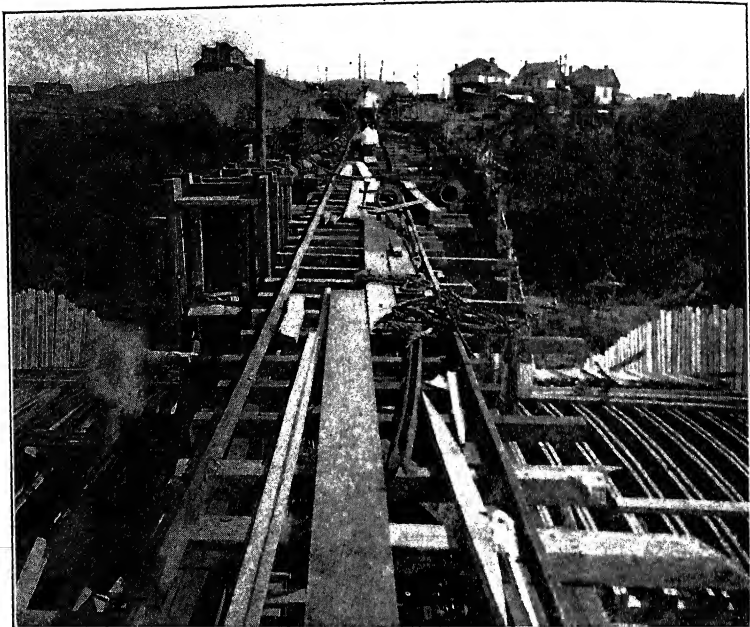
Bridge over Saskatchewan River at Saskatoon, Canada. Placing concrete by hoist and chutes.
